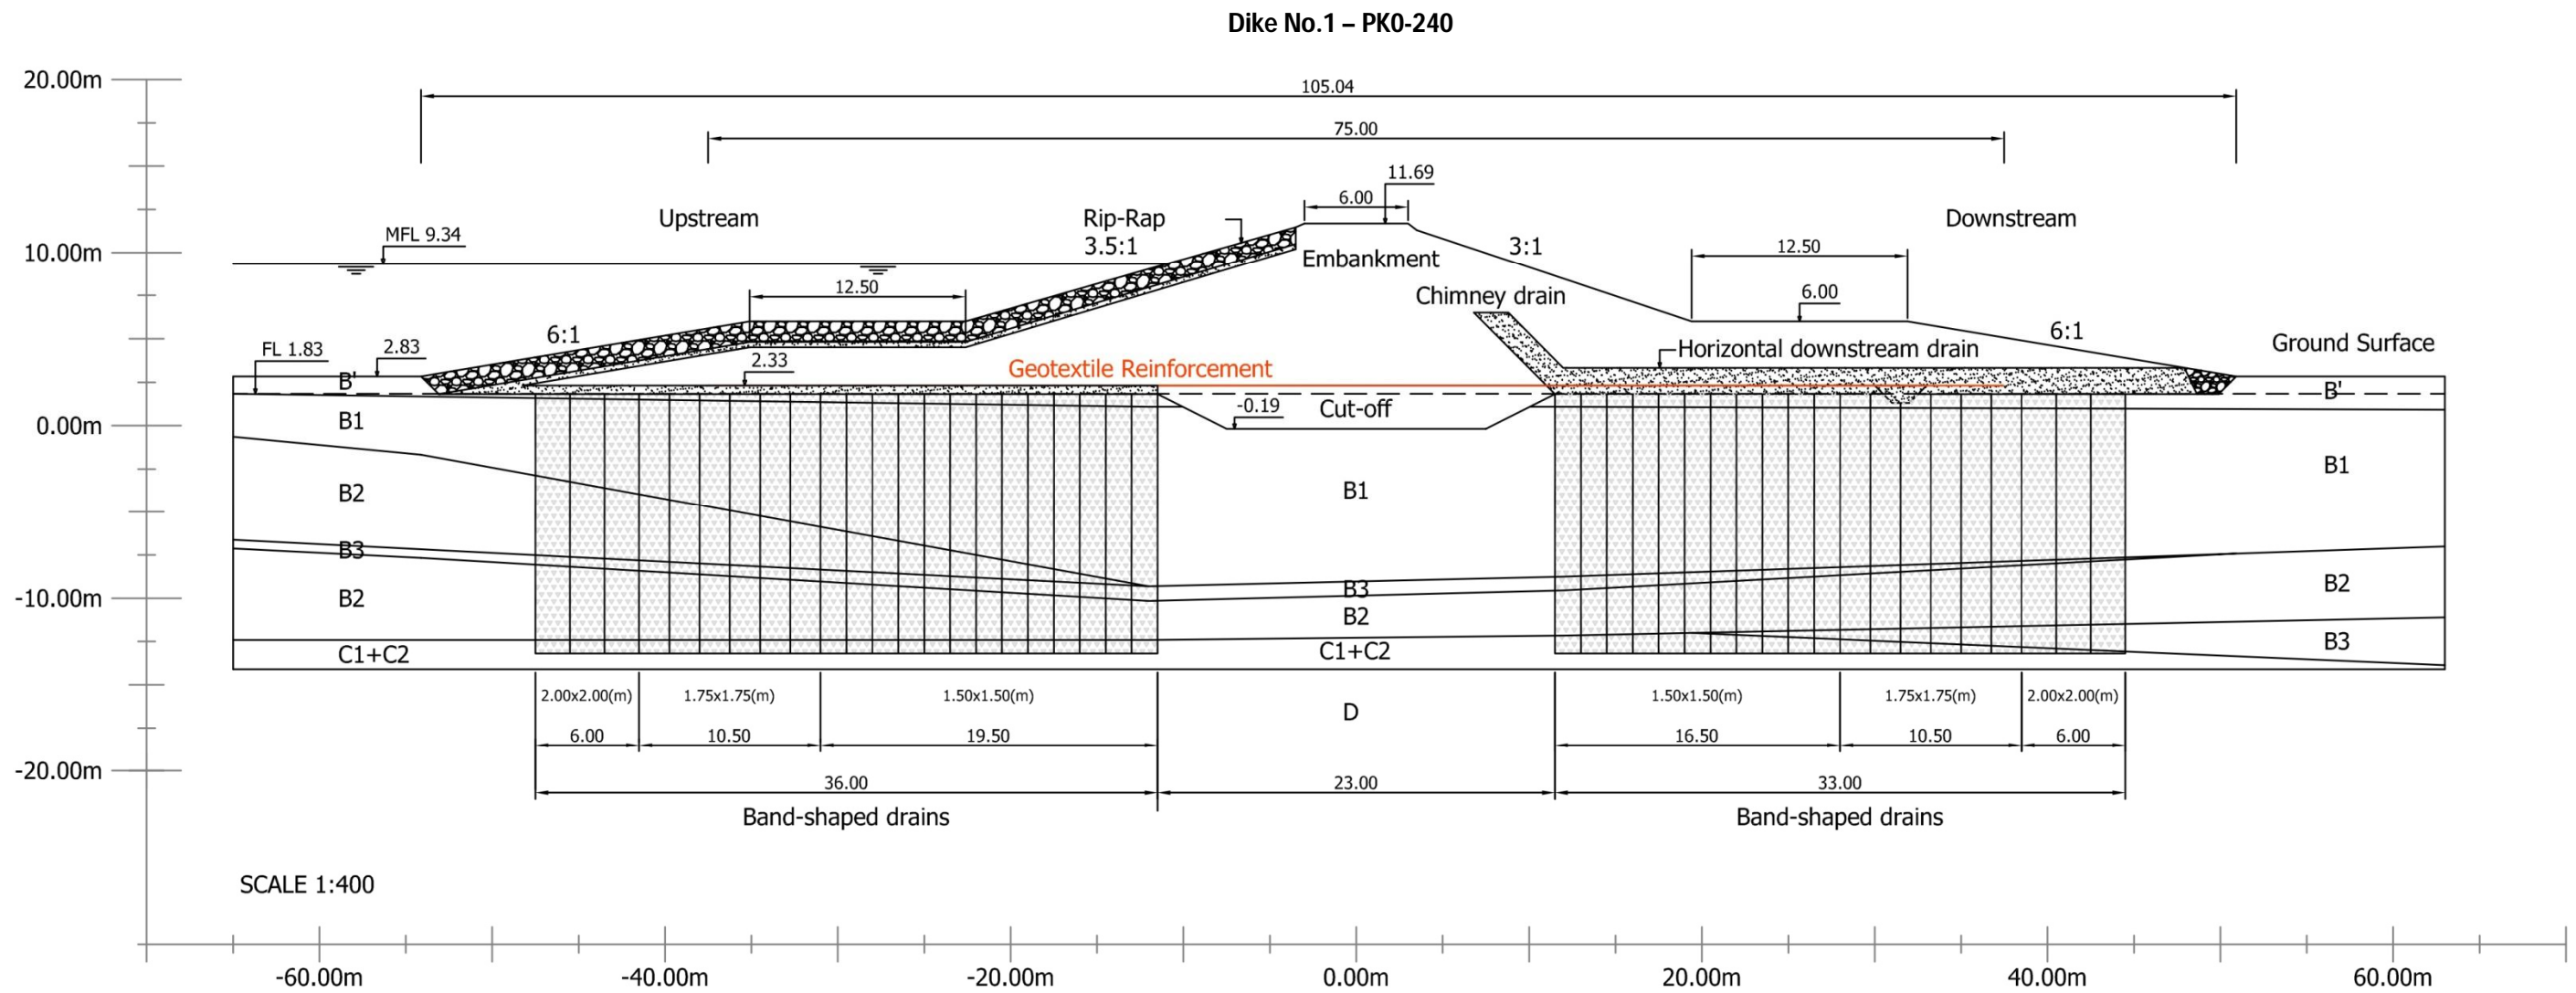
Final design of Dike No.1, showing reinforcement geotextile, band-shaped drains and clay layers.
